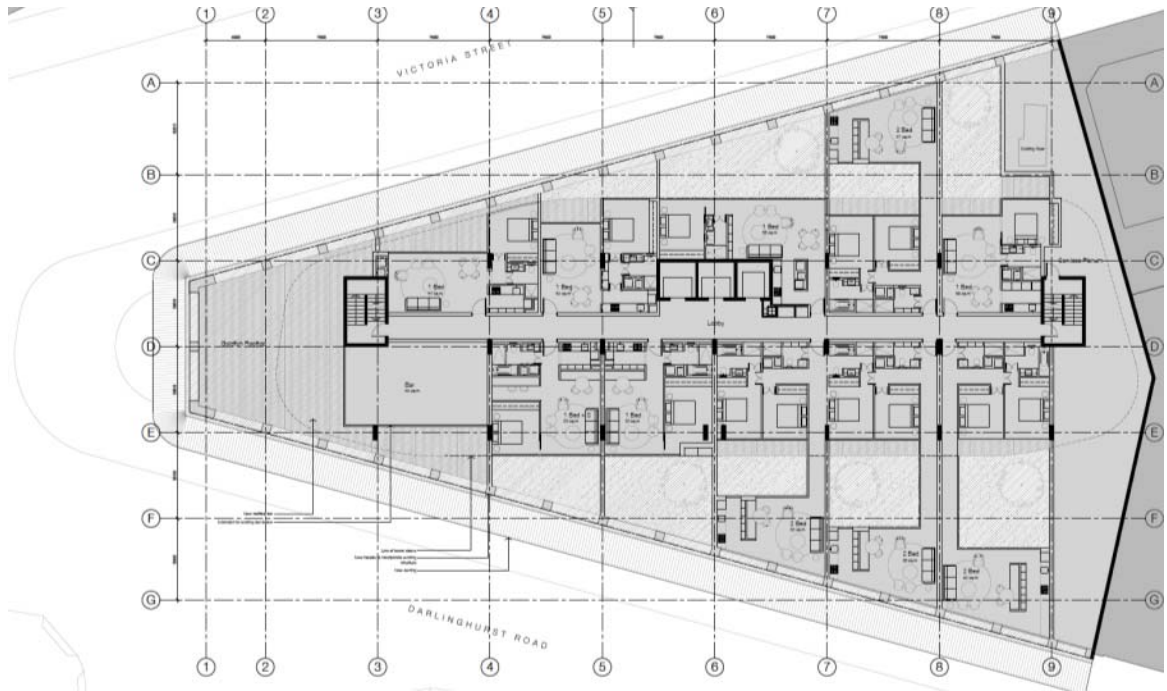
Indicative residential/commercial floor plan Level 1 (podium)
